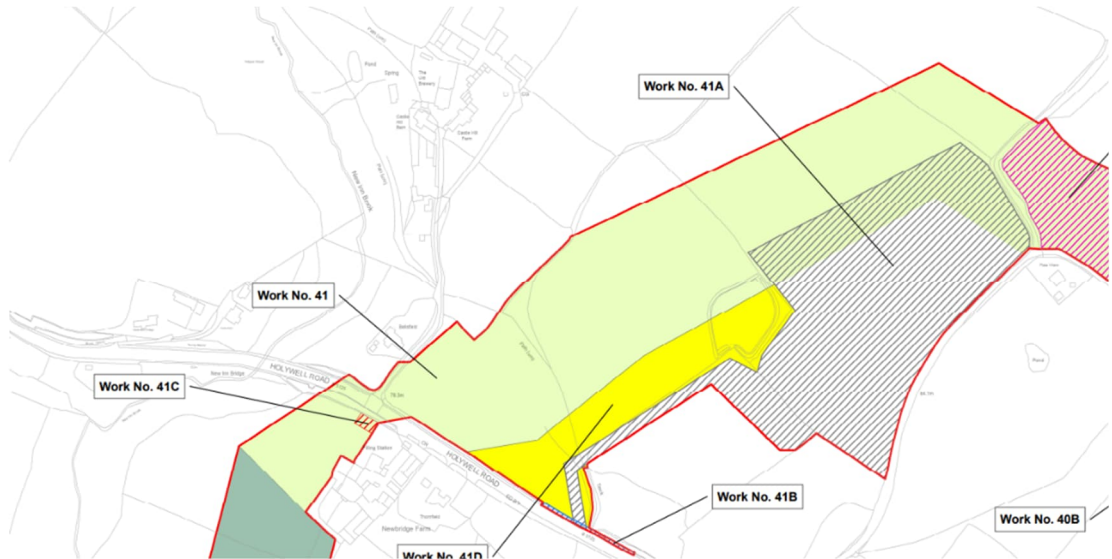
Extract from Works Plans Rev A at Application, [APP-010] Sheet 18
